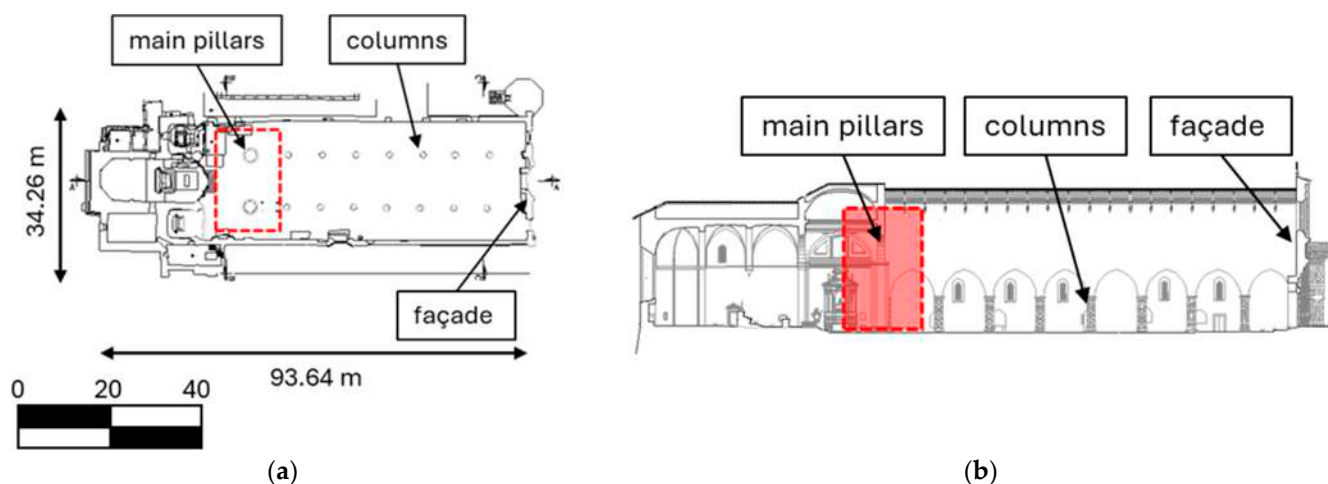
Basilica of Santa Maria di Collemaggio. (a) Plan; and (b) longitudinal section (before the partial collapse that occurred during the 2009 L'Aquila earthquake). The red dashed outline indicates the transept area that collapsed during the 2009 L'Aquila earthquake.
